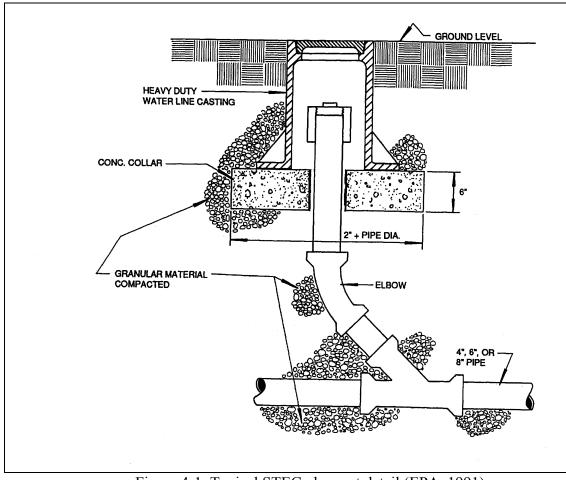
Typical STEG cleanout detail (EPA, 1991)
